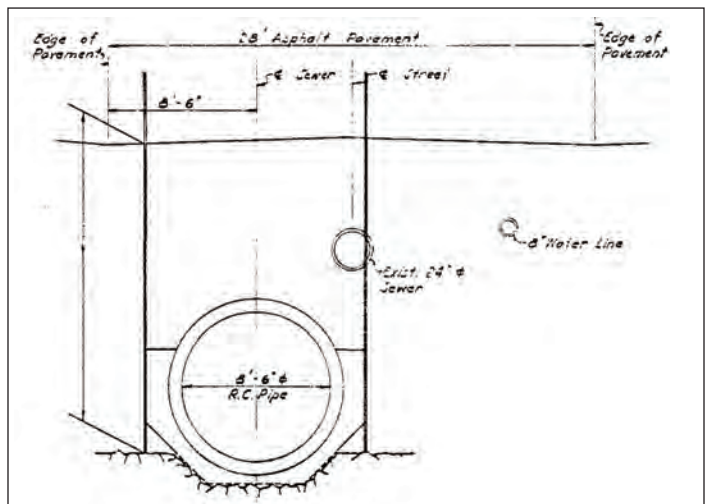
Lang Avenue sewer cross-section diagram. Buffalo Sewer Authority
